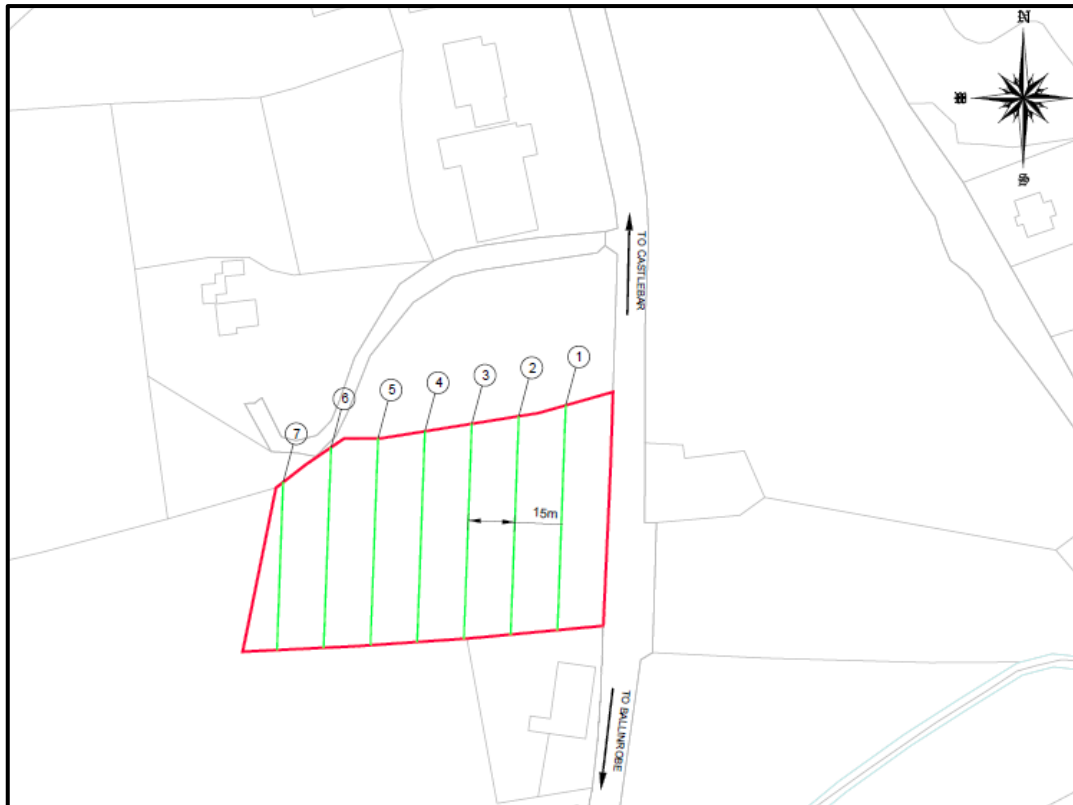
Location of Test Trenches 1-7 in Rooghaun Townland.
